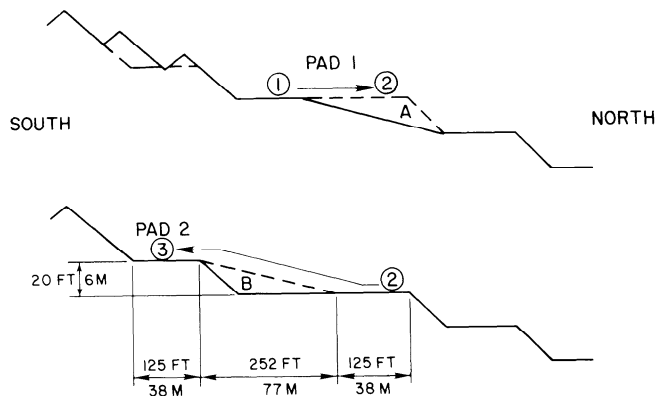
See-saw method on the spoil side. Plan view showing dragline movement up the hill.
